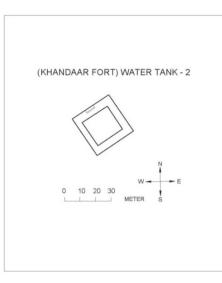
Plan of water Tank No. 2 Khandar.
